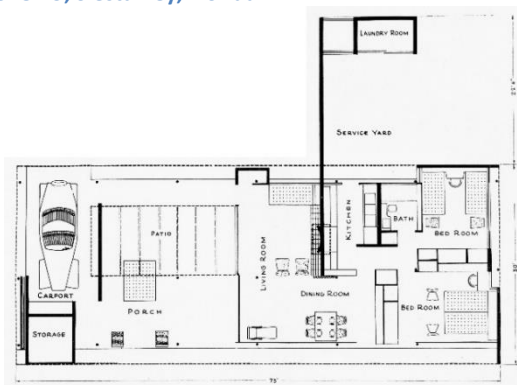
Paul Rudolph, *Revere Quality House, Floor Plan*. 1948, Siesta Key, Florida.
